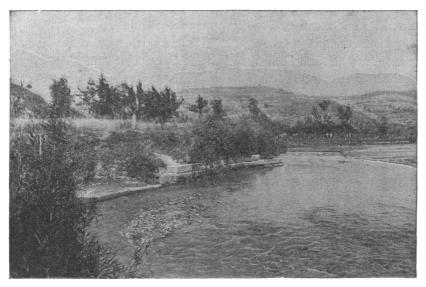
FACING-WALL NEAR SITE OF ANCIENT BRIDGE.
